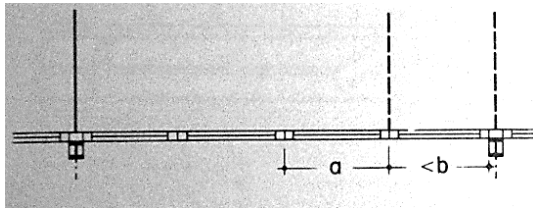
Examples of envelopes, placed behind the structural plane – large scale of the structural pattern.
